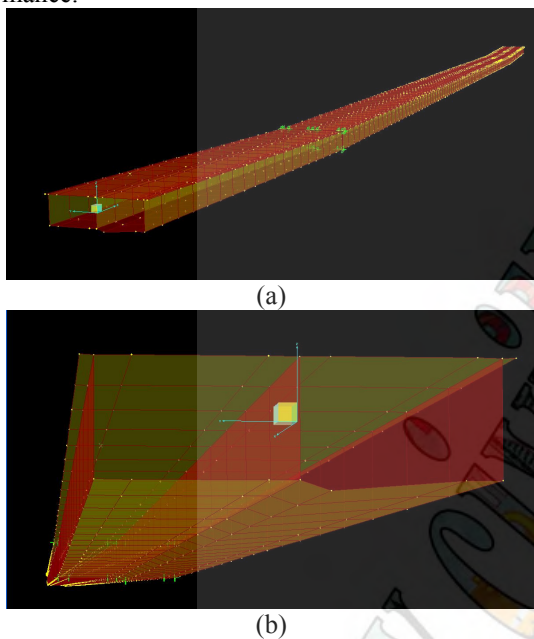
Three-dimensional SAP2000 model (a) side view and (b) front view
